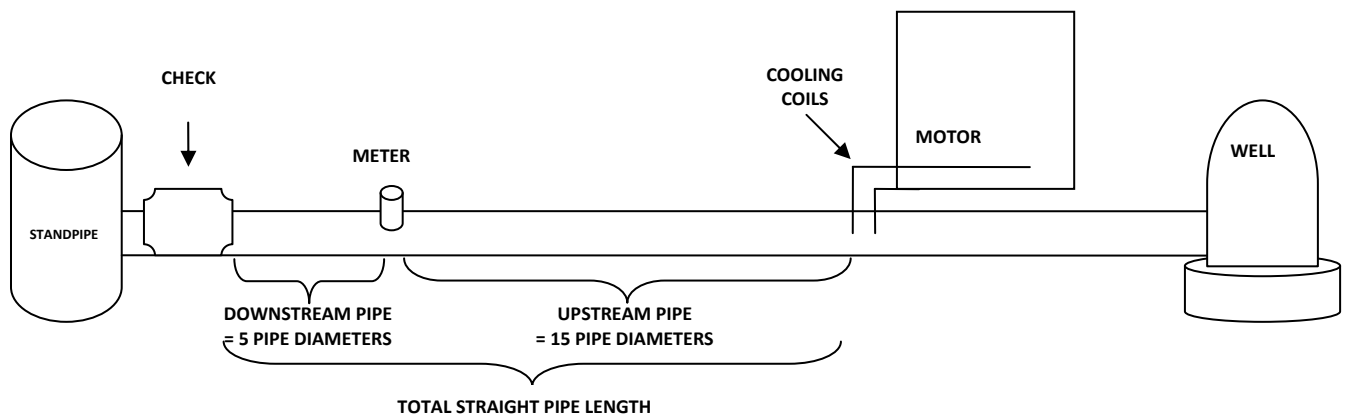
Schematic illustration of water meter installation requirements for wells completed after September 1, 2011. As noted above, water meters are to be installed a minimum of 15 pipe diameters downstream from the beginning or upstream starting point of the straight pipe.
